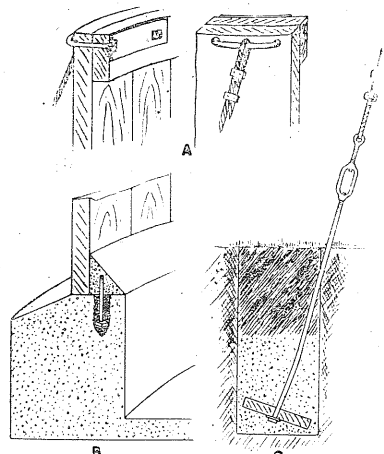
METHOD OF ANCHORING A STAVE SILO.
